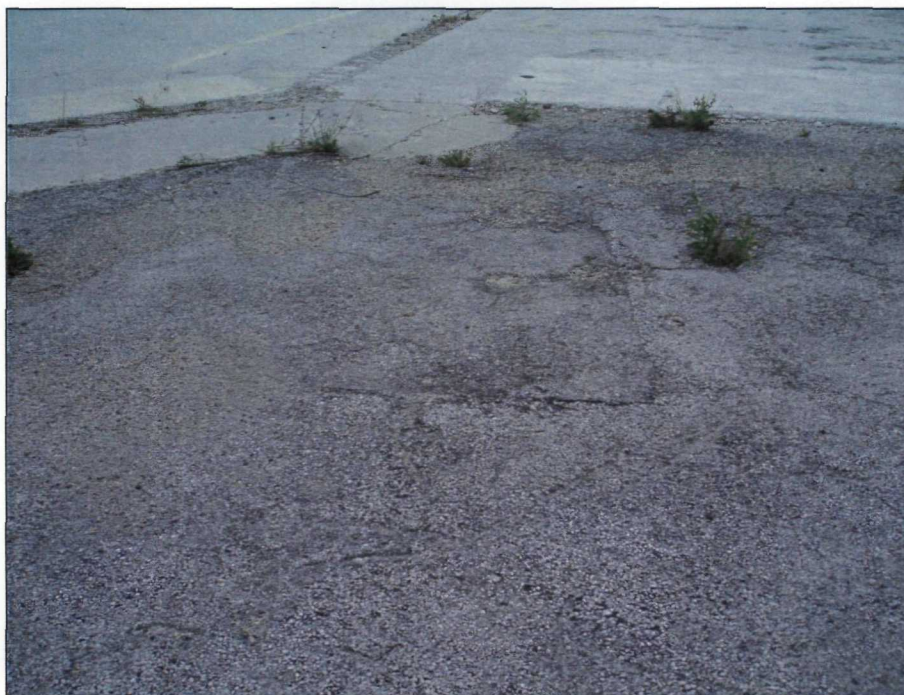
Underground Storage Tank No. 400 (UST-400)
